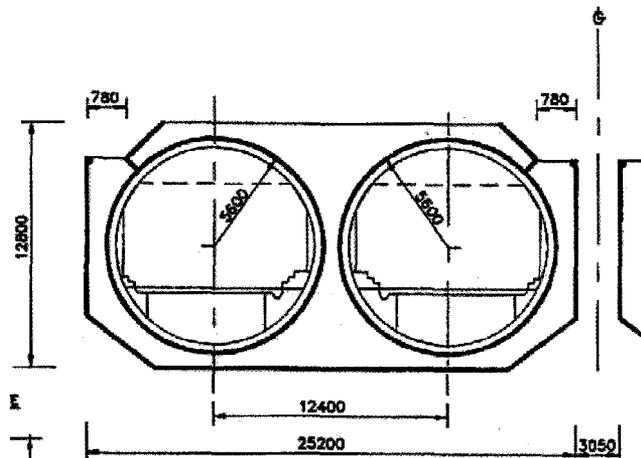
Double Steel Shell, Double Tube Tunnel
